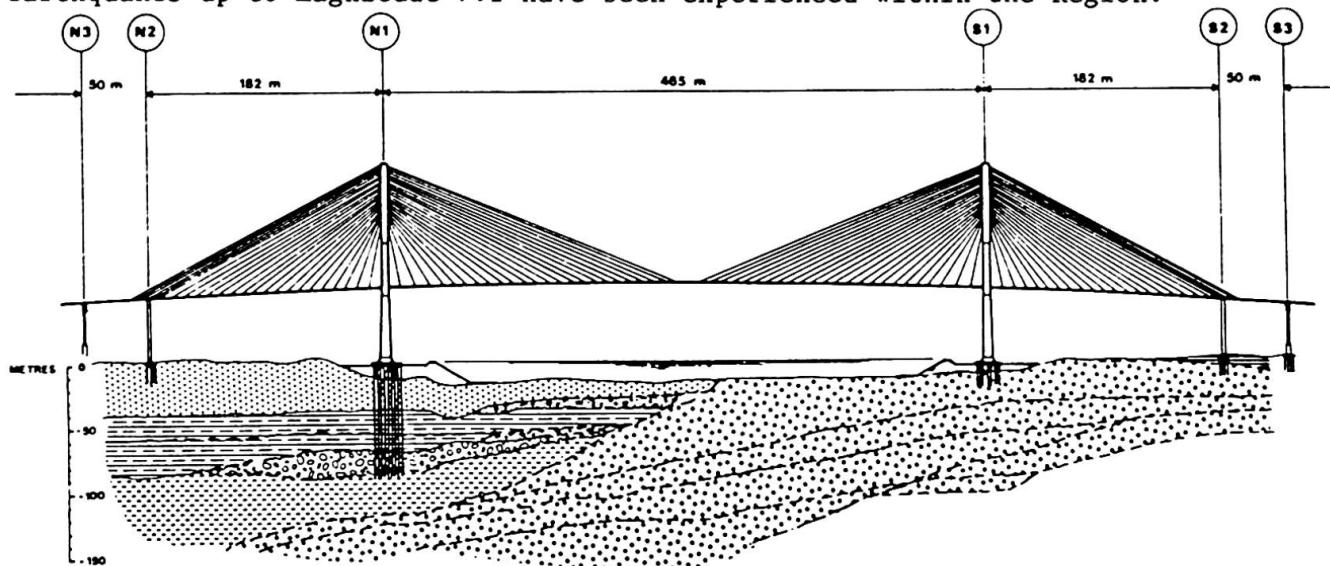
SITE GEOLOGY AND BRIDGE ELEVATION
